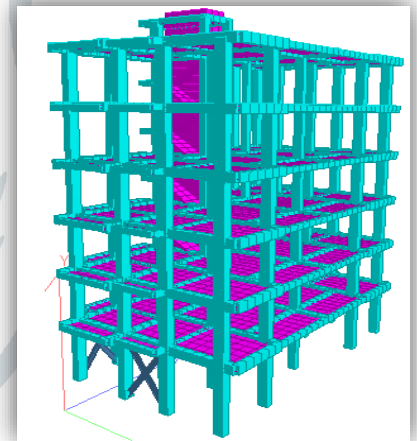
STAAD-PRO model of the building with bracing in ground storey
